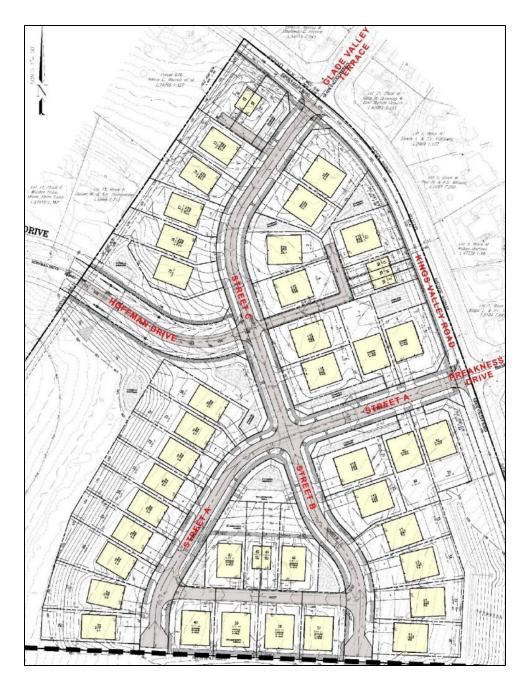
Pre-Preliminary Plan Layout with MPDUs
